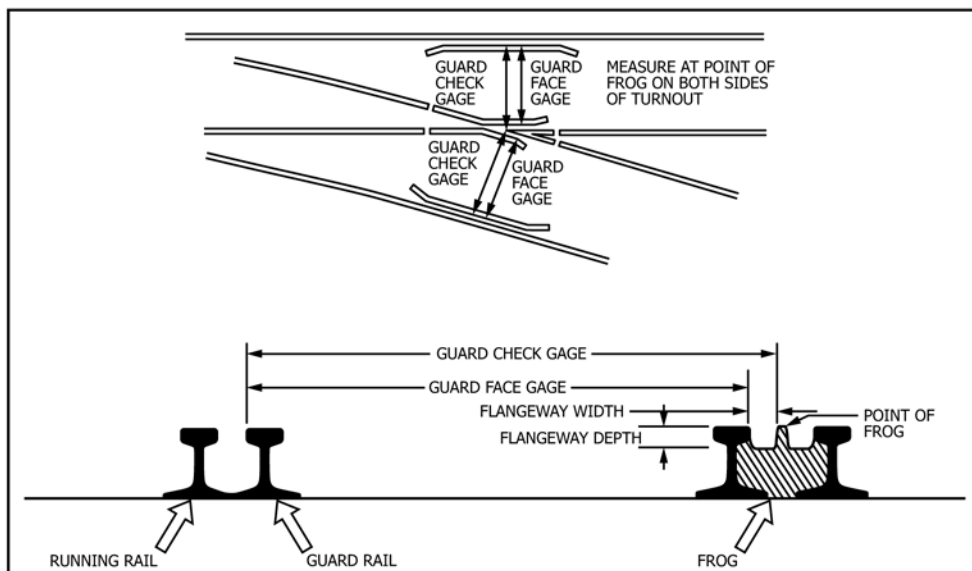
Measurement of Flangeway Width & Depth, Guard Check Gauge, and Guard Face Gauge
